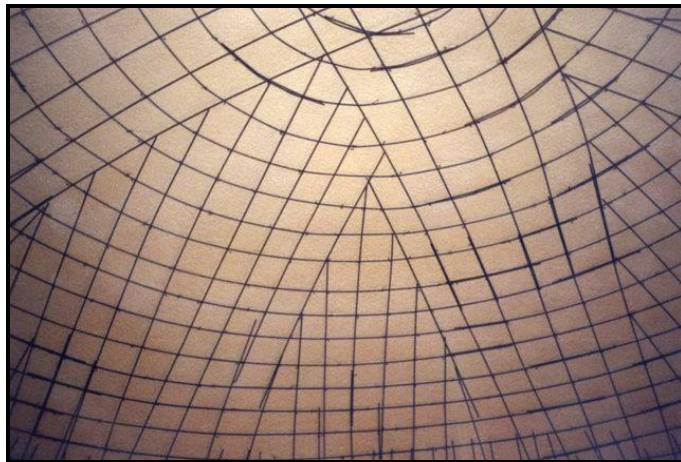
Rebar reinforcement ready for shotcrete.¹⁷
